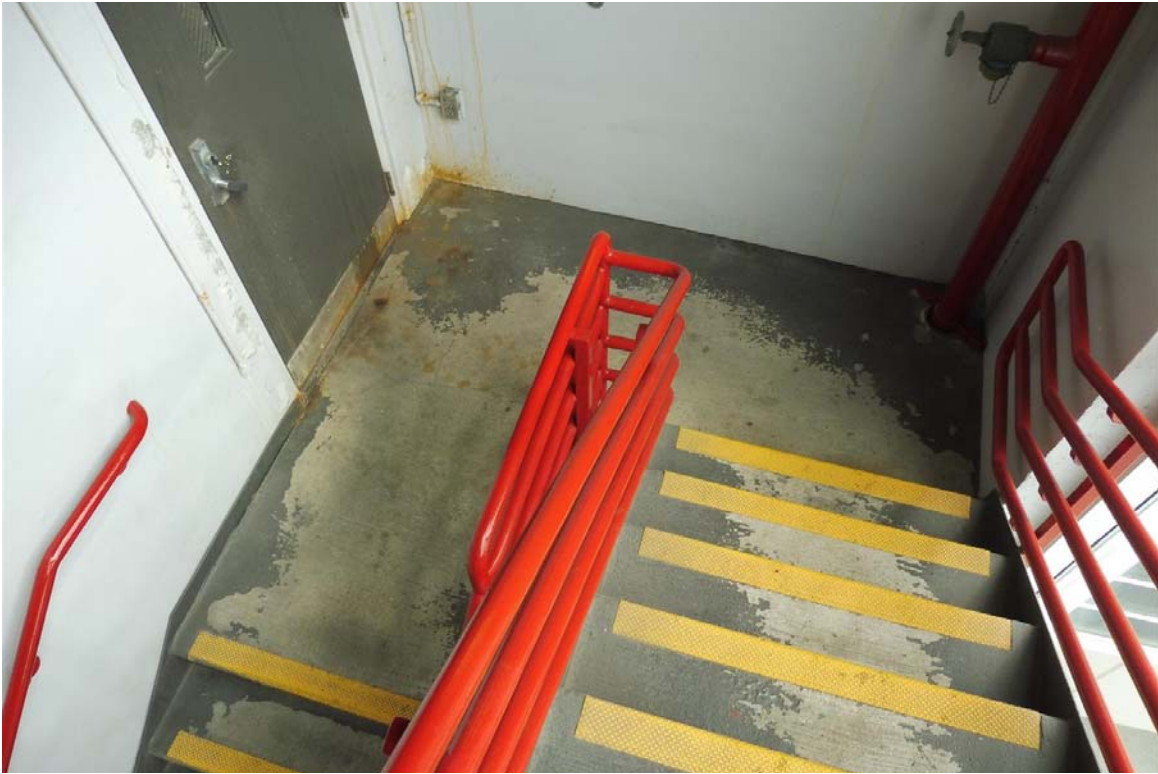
View of the failed floor coating that was previously applied to the treads and landings. We suggest replacement of the coating system to increase the protection of the metal pan stair structure below the concrete landings and treads.
